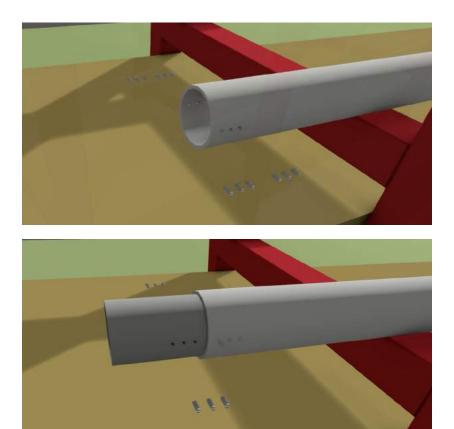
The site assembly jig is erected and sub-assemblage are built out of pre fabricated pipe sections. Rod tops are also installed at this point.
